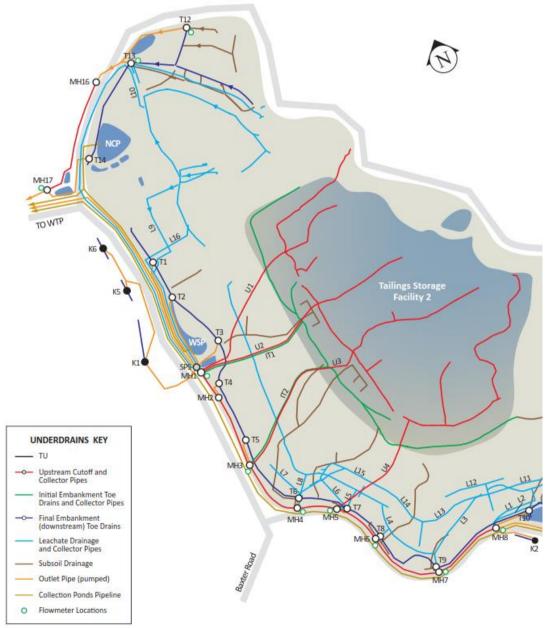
STORAGE 2 SUBSURFACE AND LEACHATE DRAINAGE NETWORK
